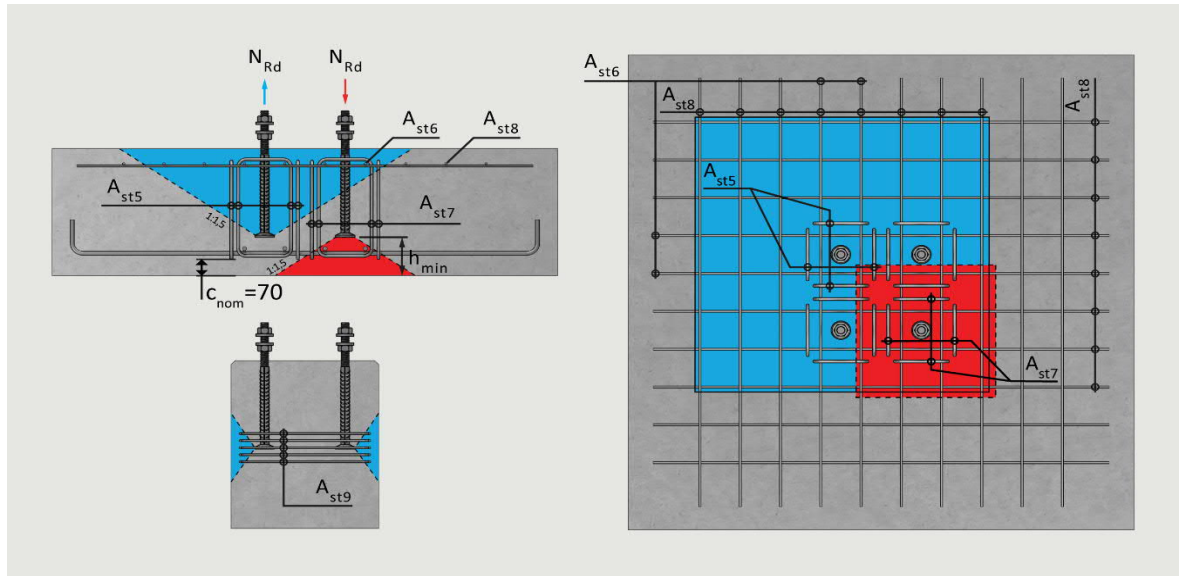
ATP® bolt's axial force and splitting reinforcement in a column footing
